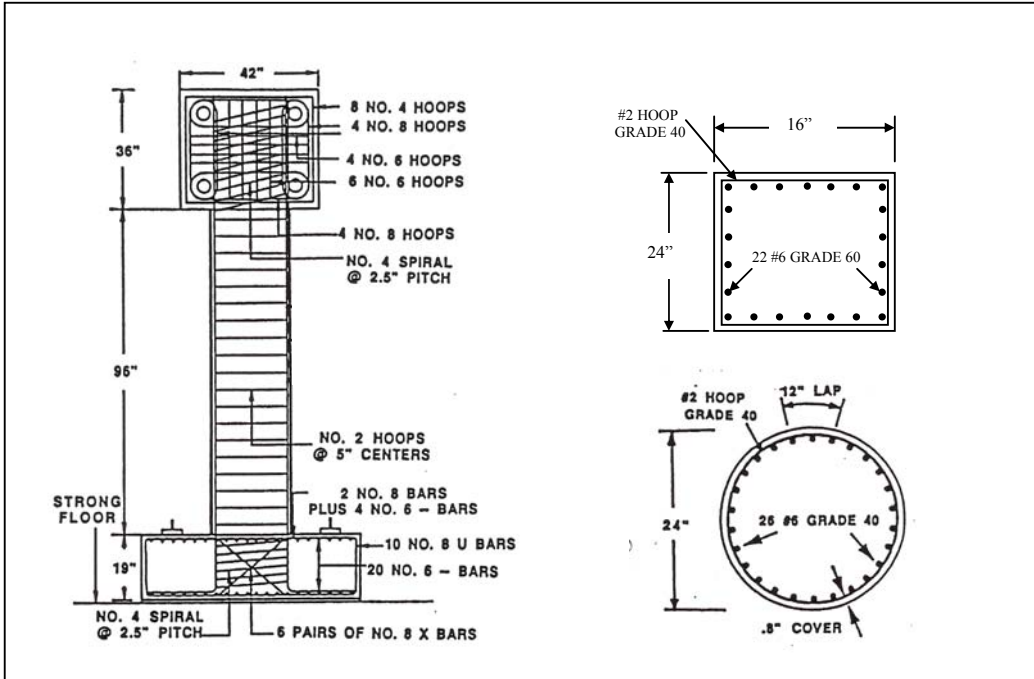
Dimensions and Reinforcement Details of Test Specimens
